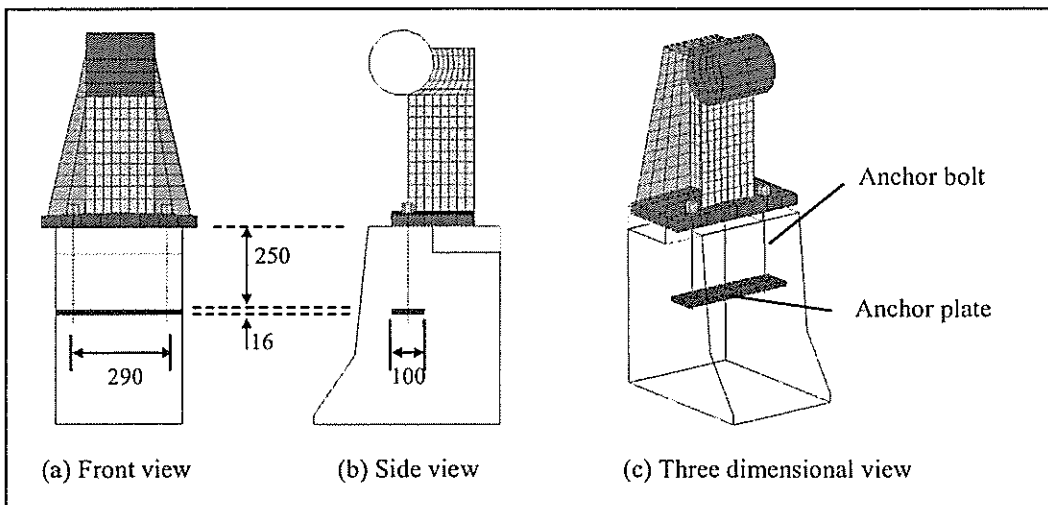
Connections between a Post and the Concrete Base (unit: mm)
